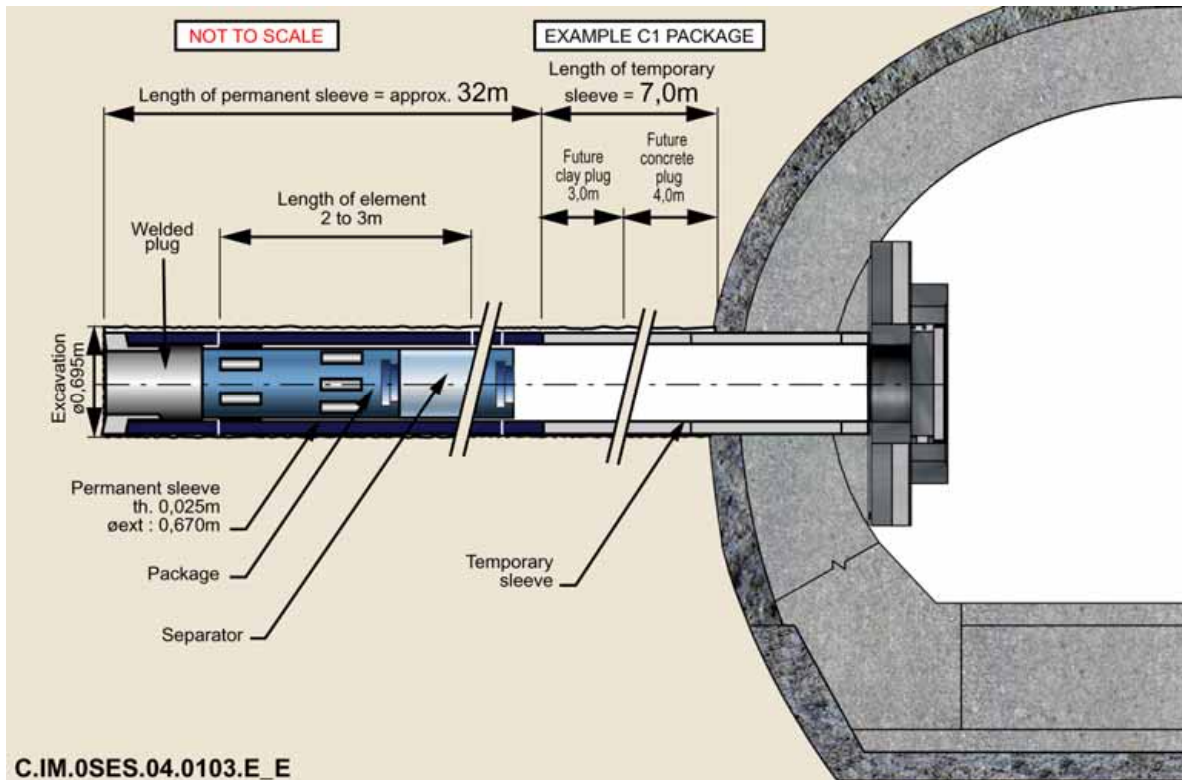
Detailed longitudinal section of the C cell (distorted proportions)
